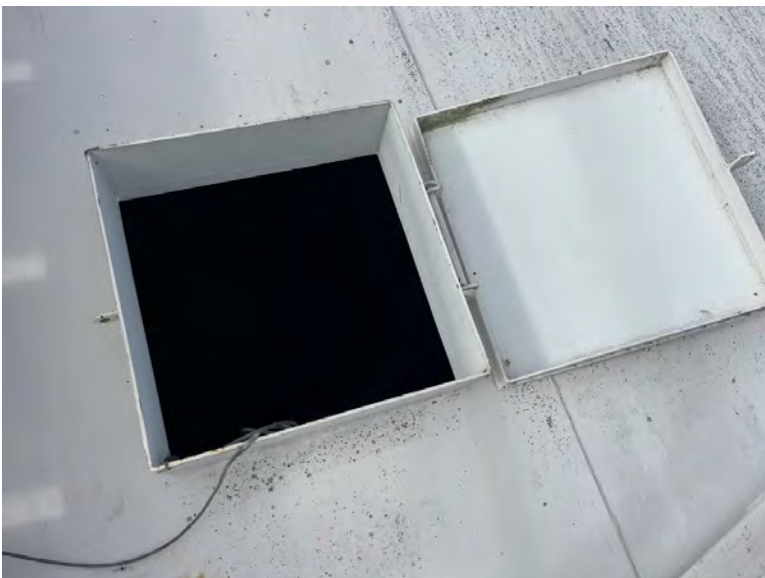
''x 24'' wet area access hatch. It was not secured with a lock before or after the inspection. The hinge was sprung making securing the hatch cover difficult.
